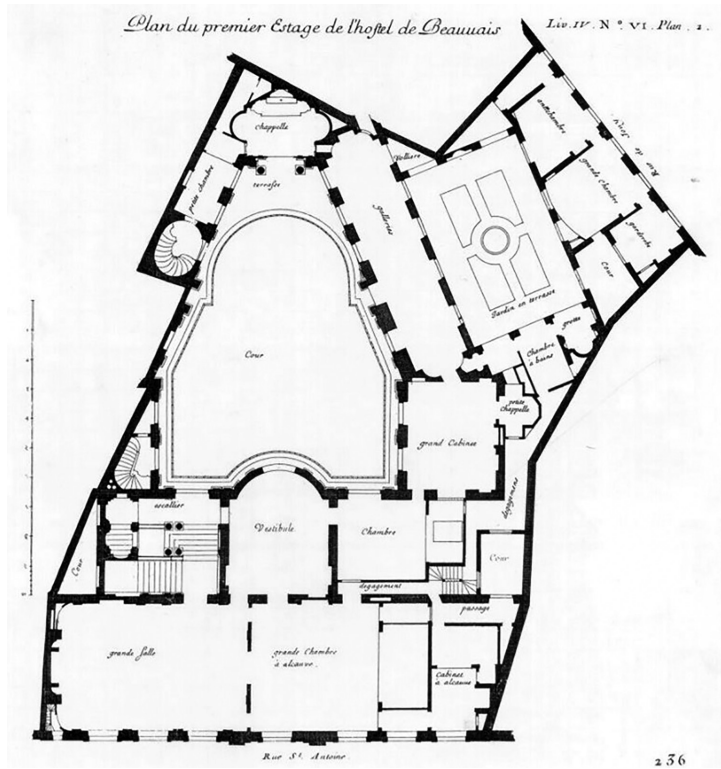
Antoine Le Pautre, Hôtel de Beauvias, Paris, 1657, ground plan. Asian Architectural Archive Center.
